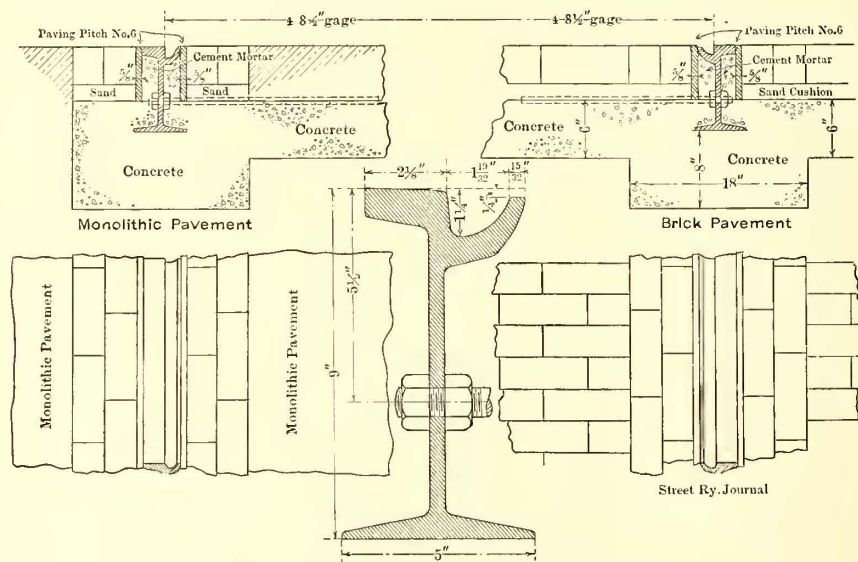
TYPE OF GUARD RAIL AND PAVEMENT CONSTRUCTION USED FOR PART OF THE KALAMAZOO LINES OF THE MICHIGAN TRACTION COMPANY
